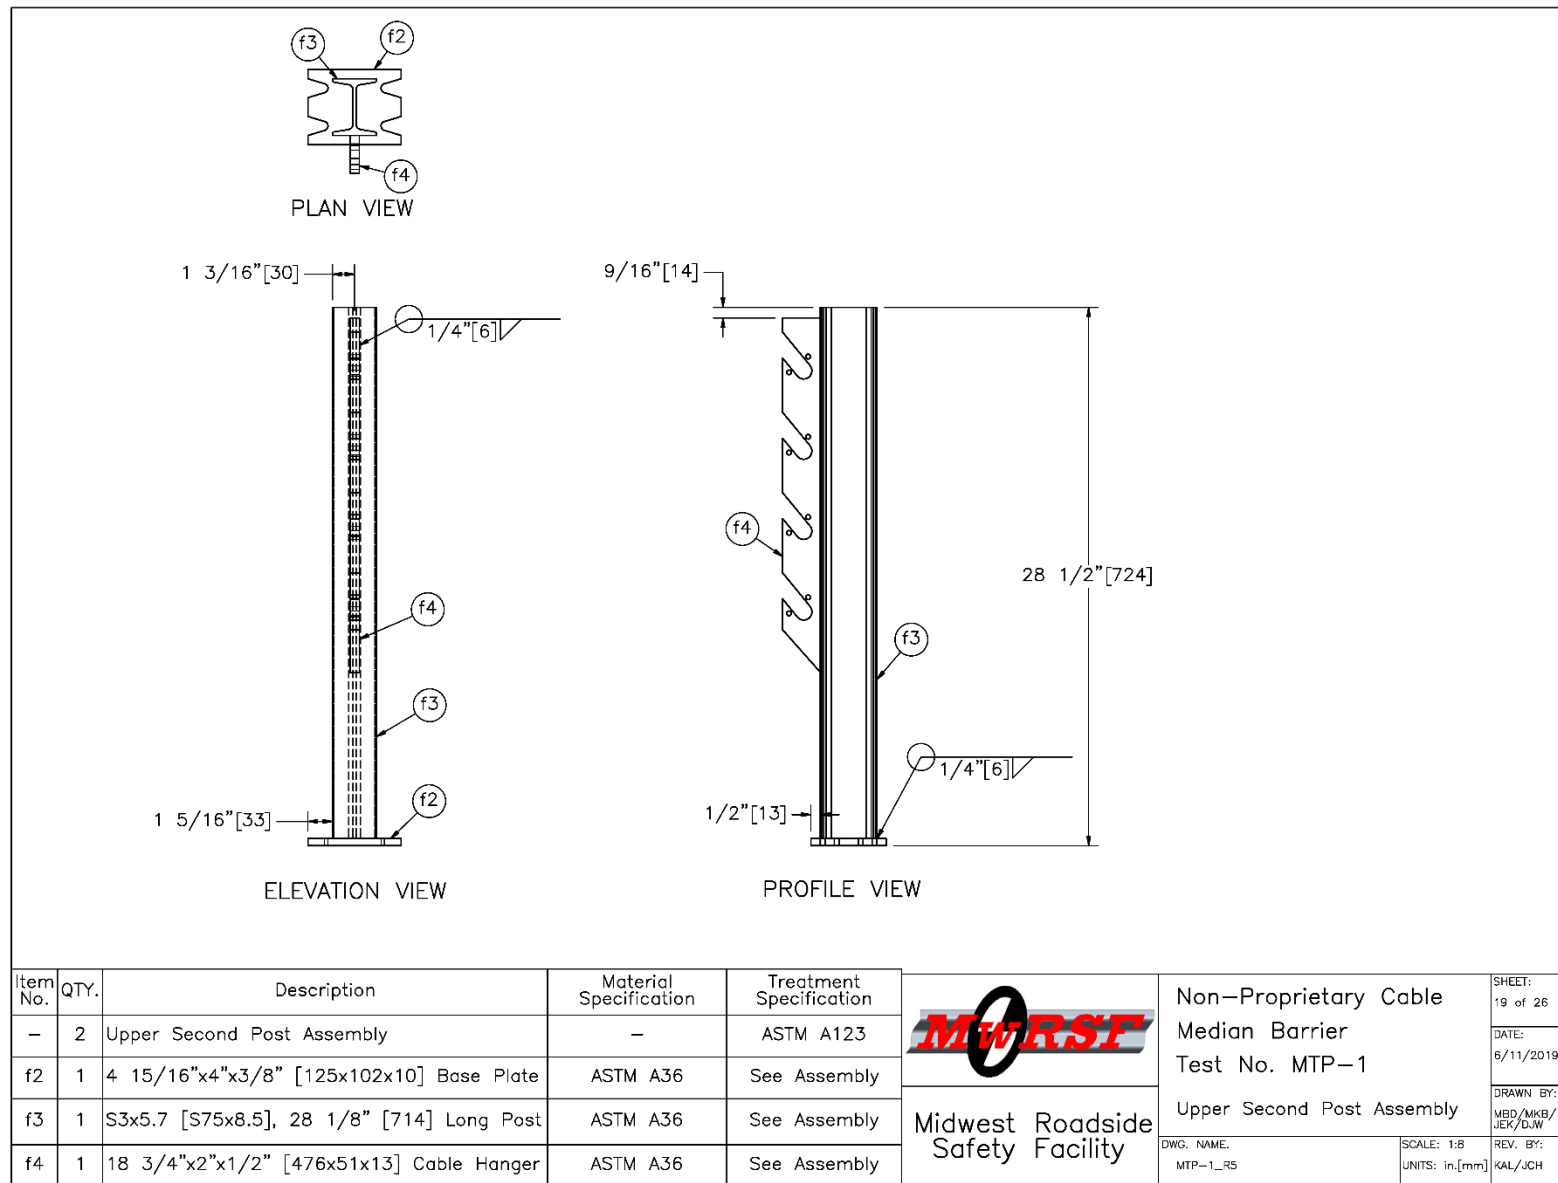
Upper Second Post Assembly, Test No. MTP-1
